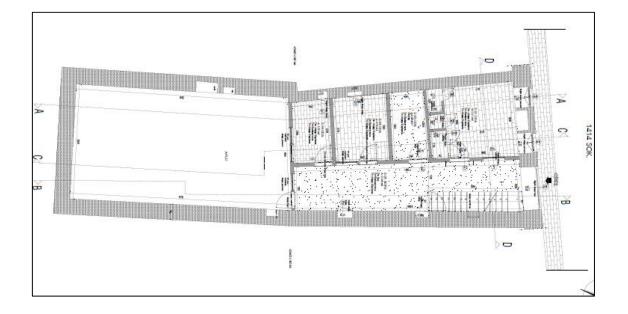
Nurten Terlikçi House ground floor restution plan (Created by the author)
